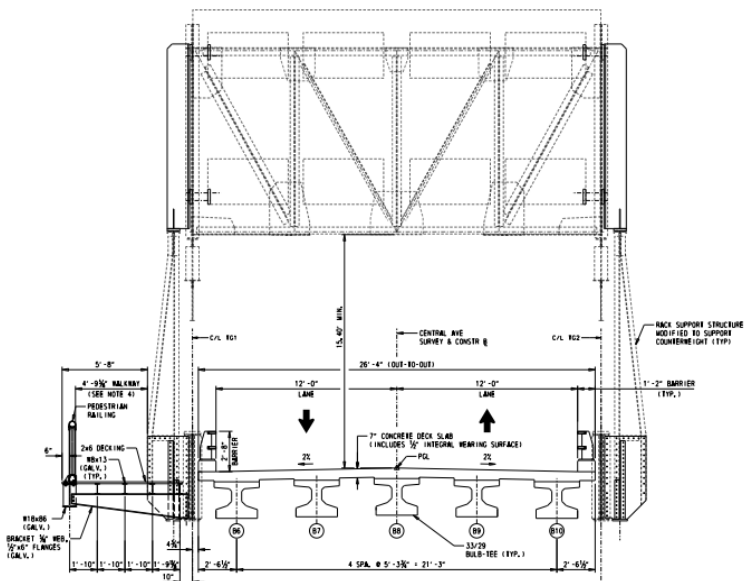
Prestressed Bulb-Tee Girder Option, Span 2
